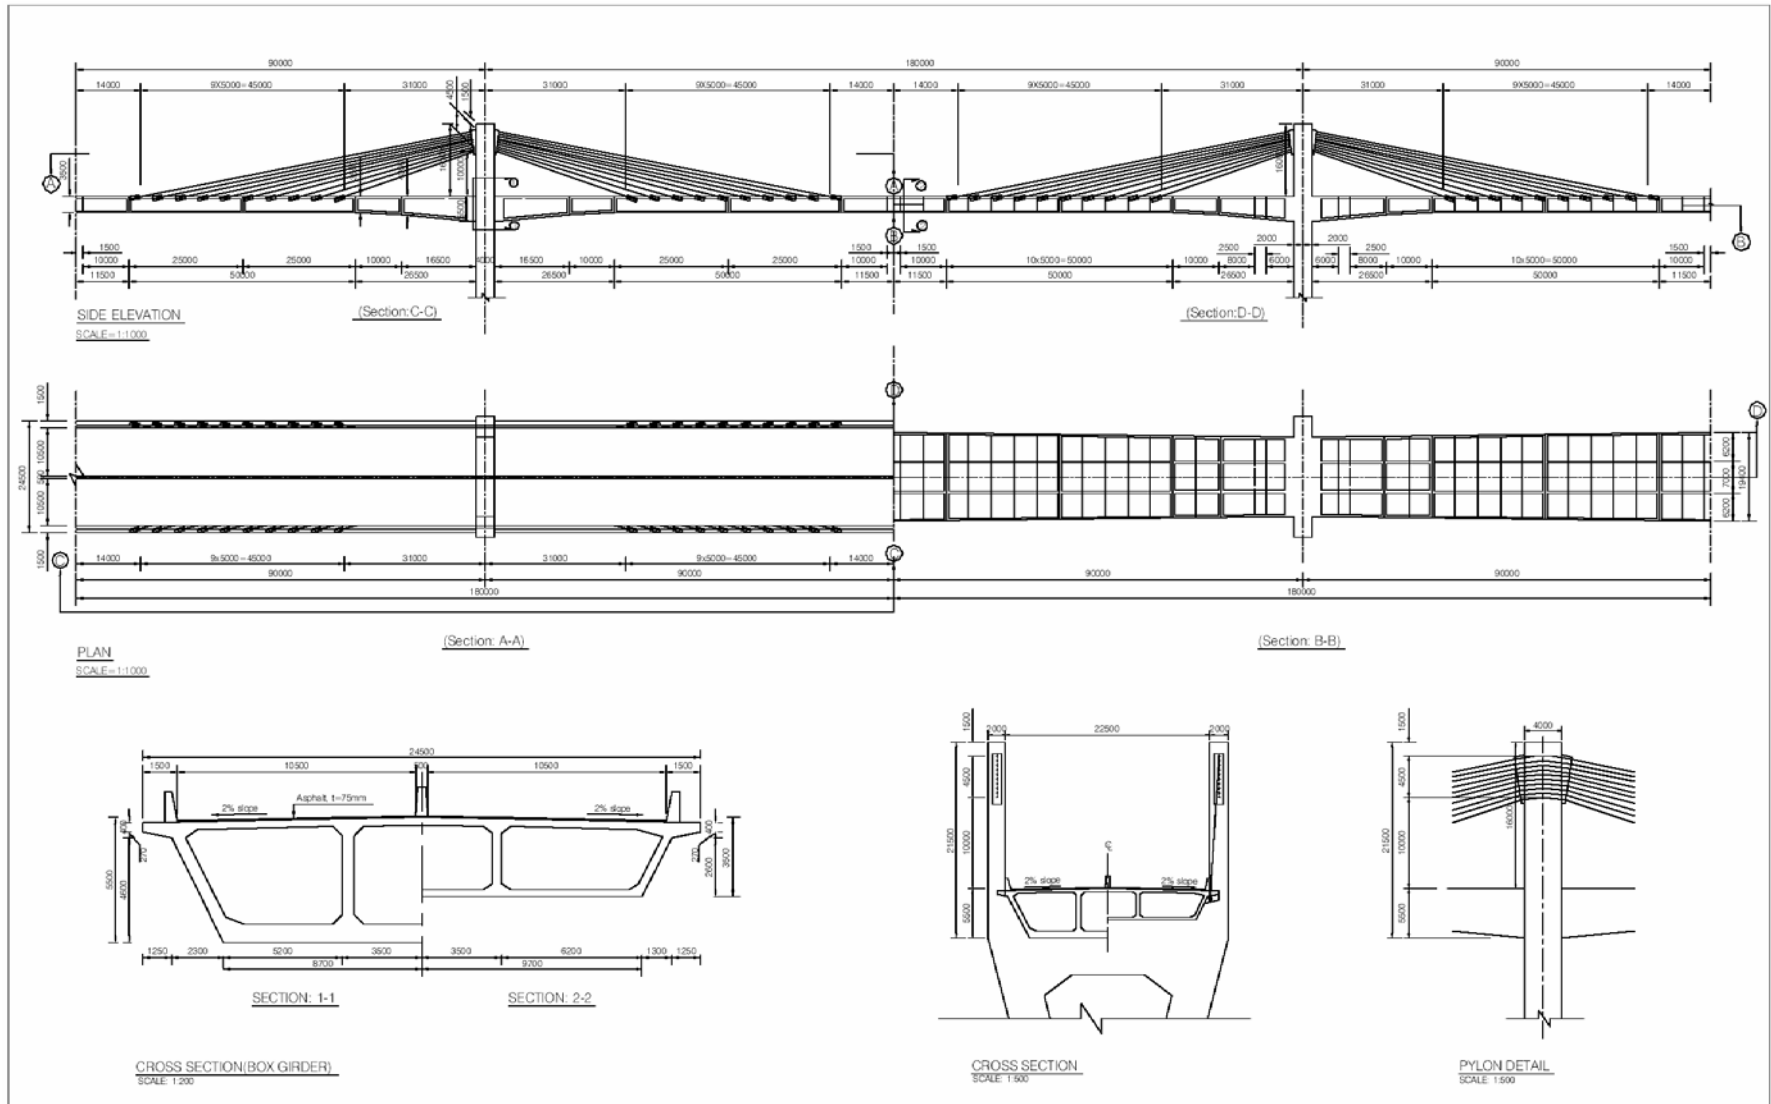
General View of Extradosed Bridge for the Base Case
